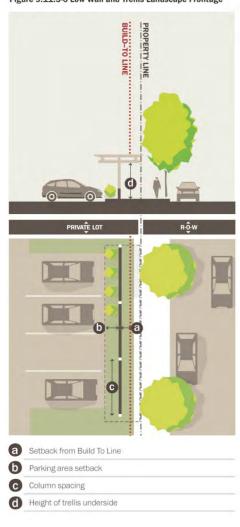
Low Wall and Trellis Landscape Frontage
